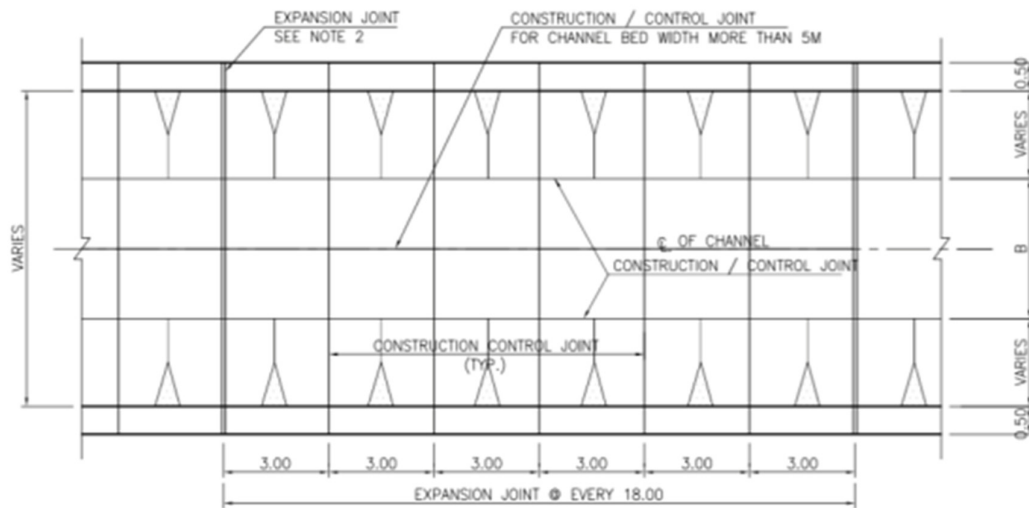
Key plan for expansion and construction joints based on the traditional proposal
